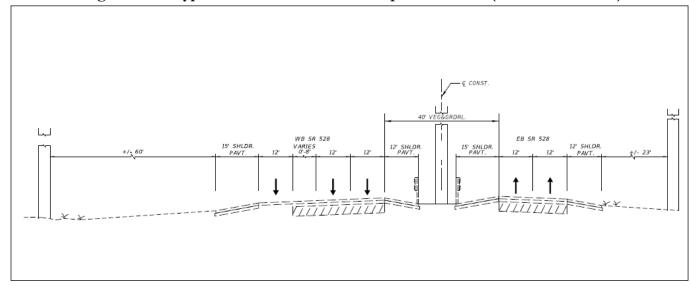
Typical Section at SR 528 Underpass at SR 417 (Structure #s 750467, 750468, 750469)
